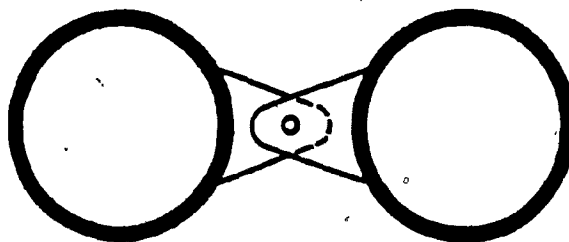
SECTION OF A TEMPORARY ERECTION CONNECTION.
